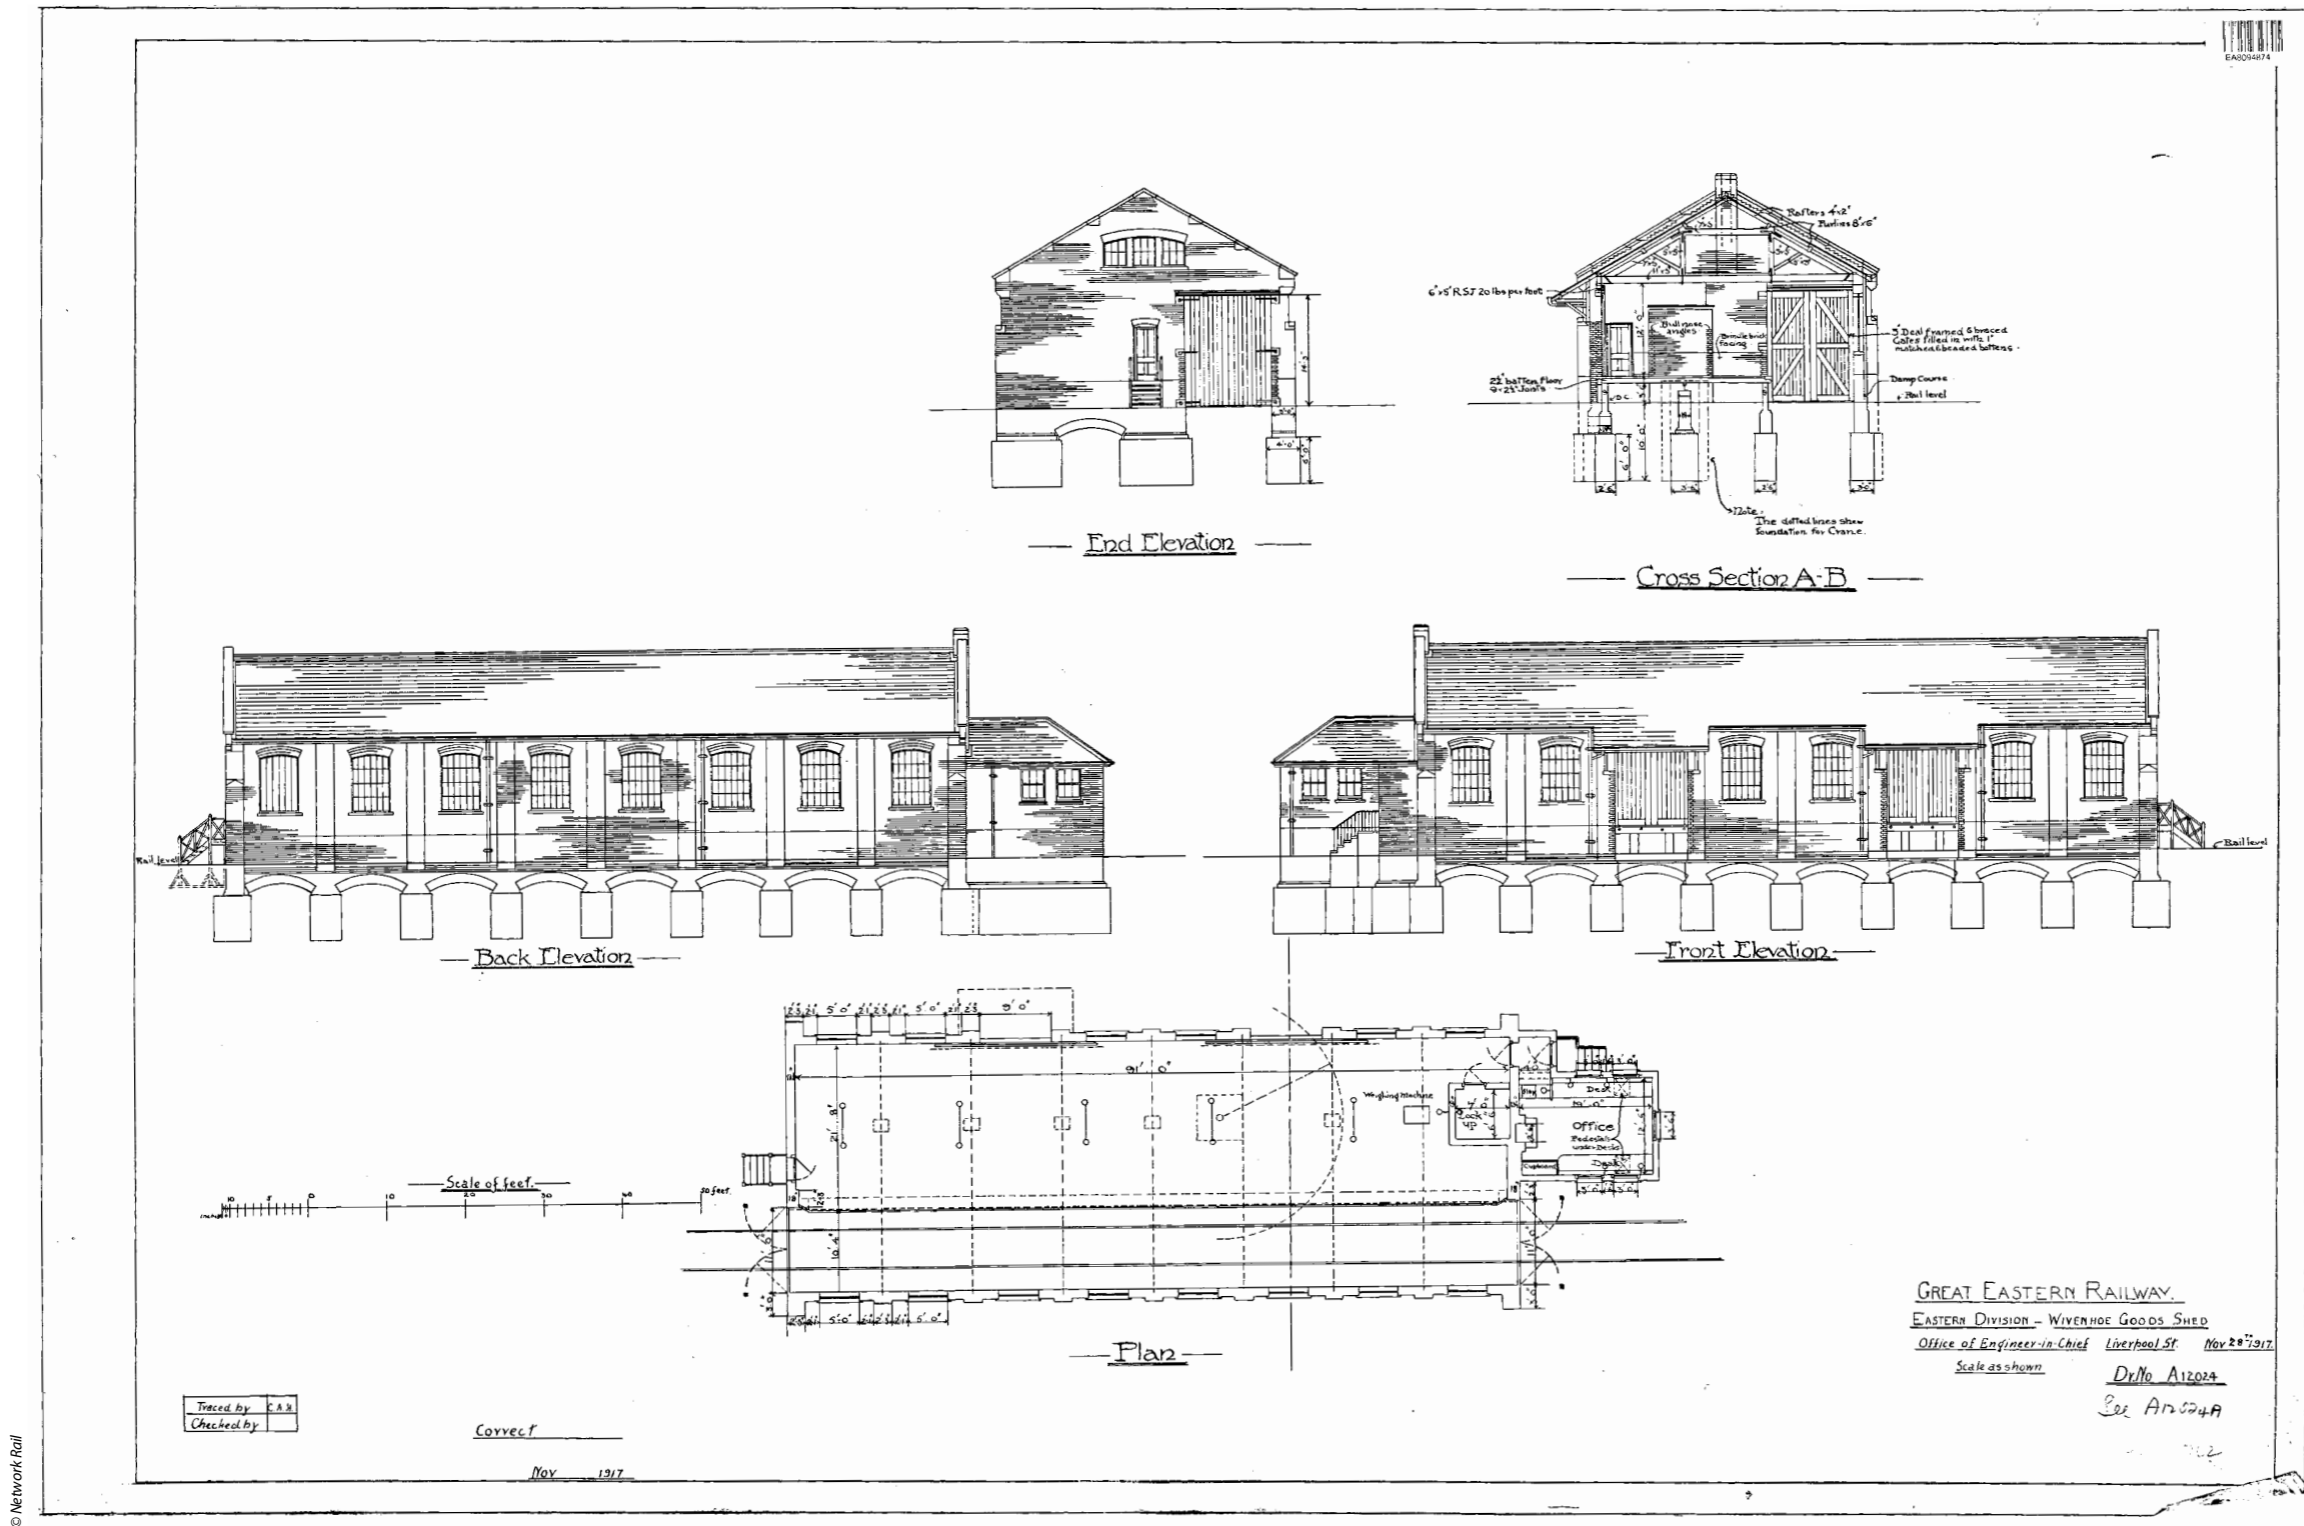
Plan of Wivenhoe Goods Shed (traced in 1917)
